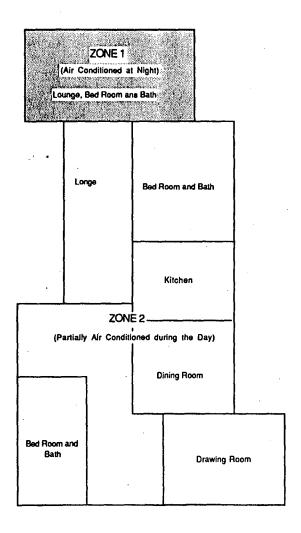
a General Floor Plan of the Prototype Single Family House (Ground Floor)
